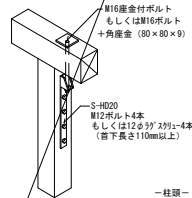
A 3D perspective diagram showing the connection of a vertical steel column to a horizontal steel beam. The column is labeled "S-400" and has four M12 bolts. The beam is labeled "M16アンカーボルト" and has a length of 300mm or more. A label "柱脚" (column base) points to the connection point. A note indicates that the bolts should be 12φ9 or 20φ4, with a minimum diameter of 10mm.
